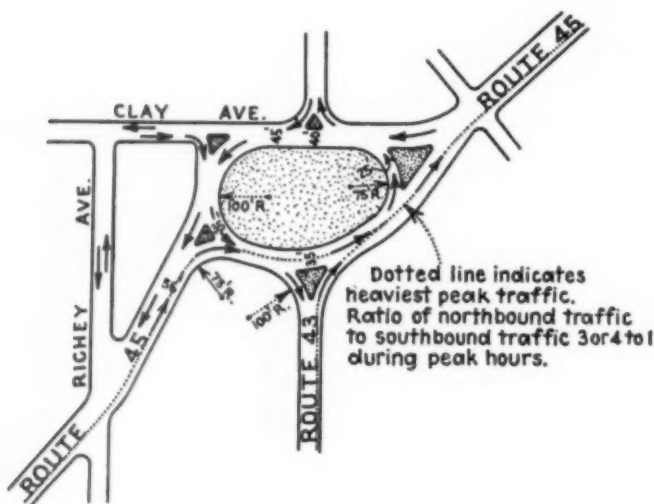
Traffic circle, Borough of Collingswood, N. J., 3.8 miles southwest of Camden-Philadelphia Bridge; designed 1925, constructed 1926
